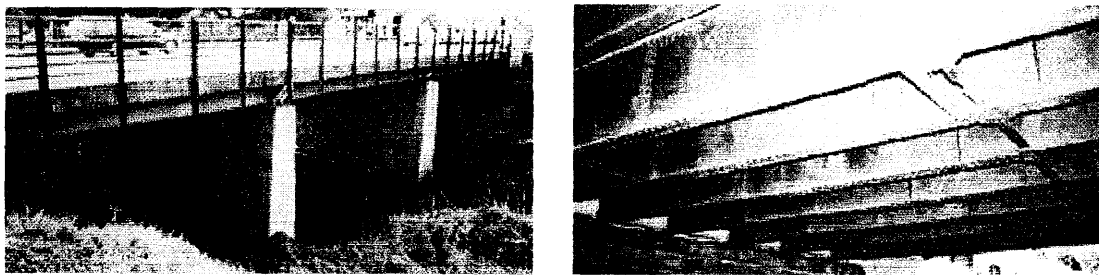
Left, the widened face of the Argyle Street (formerly Hume Highway), and Right the 1899 steel plate web girders. The bridge is still in service.
